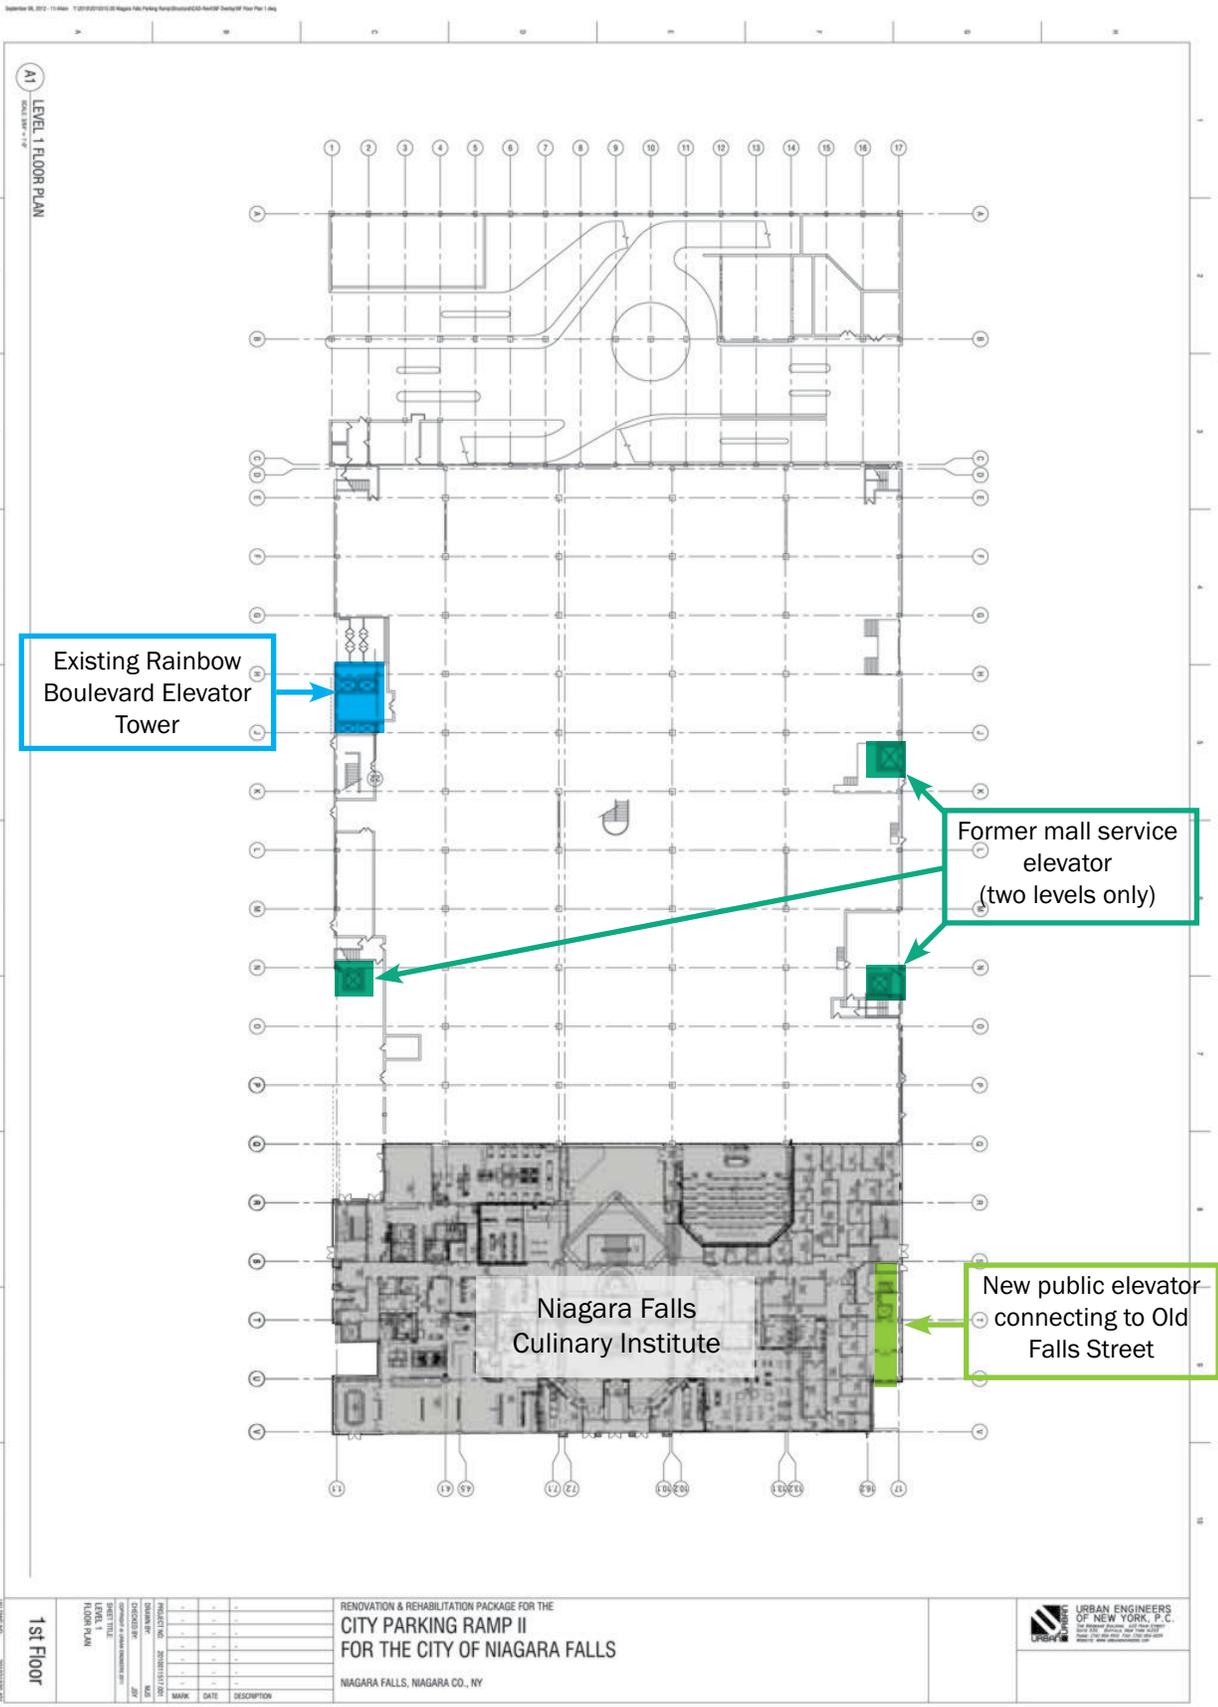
First floor plan of the former Rainbow Centre Mall.
